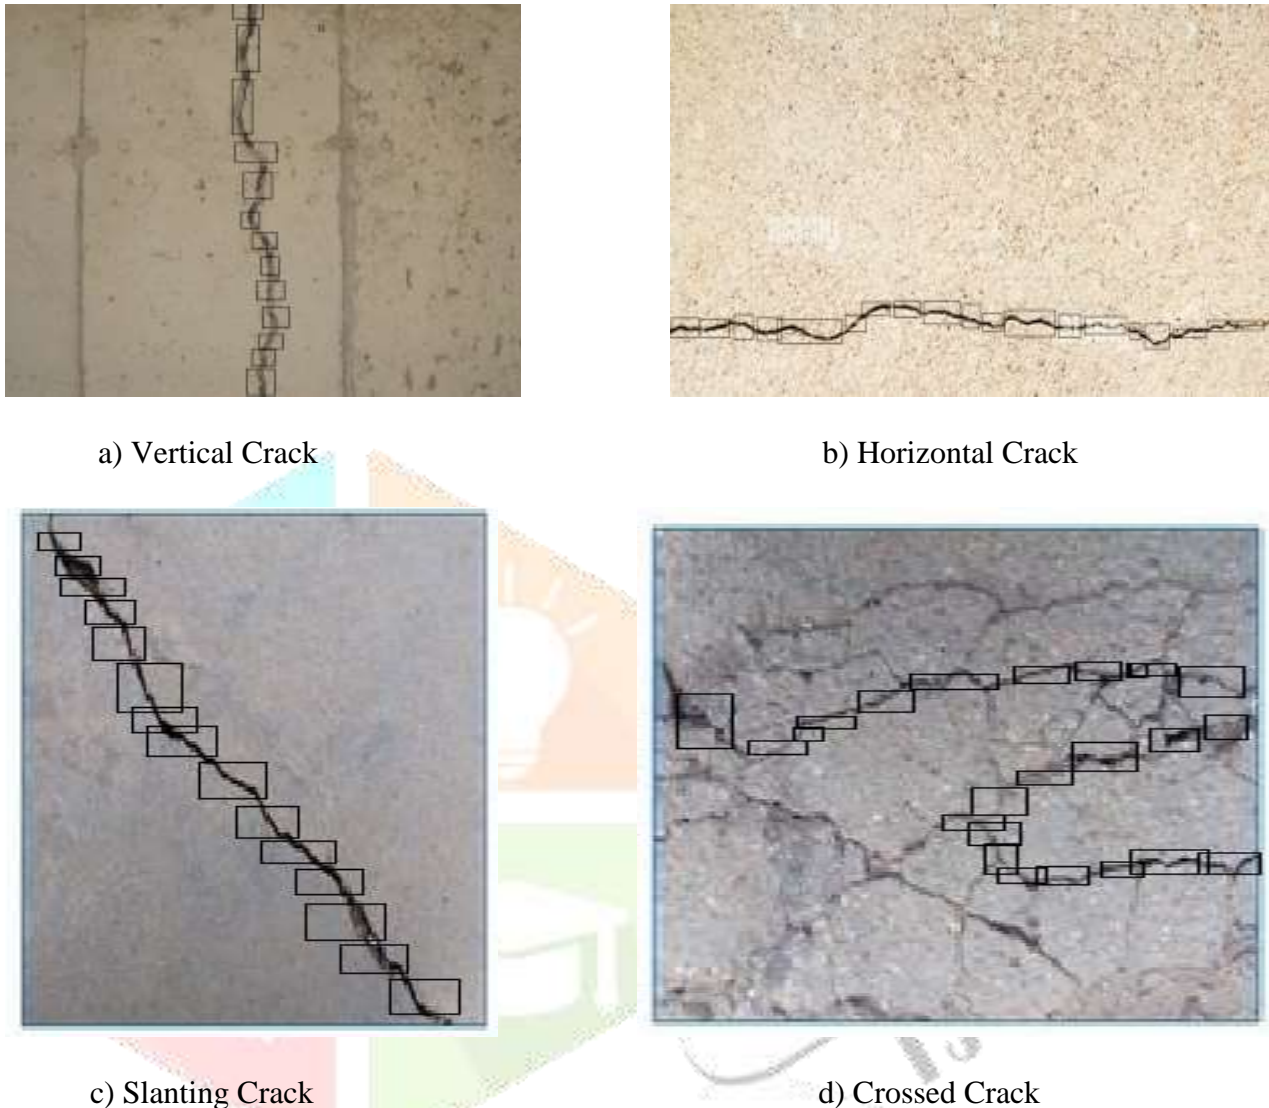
Four kinds of crack detection: (a) vertical crack; (b) horizontal crack; (c) slanting crack; (d) crossed crack.
